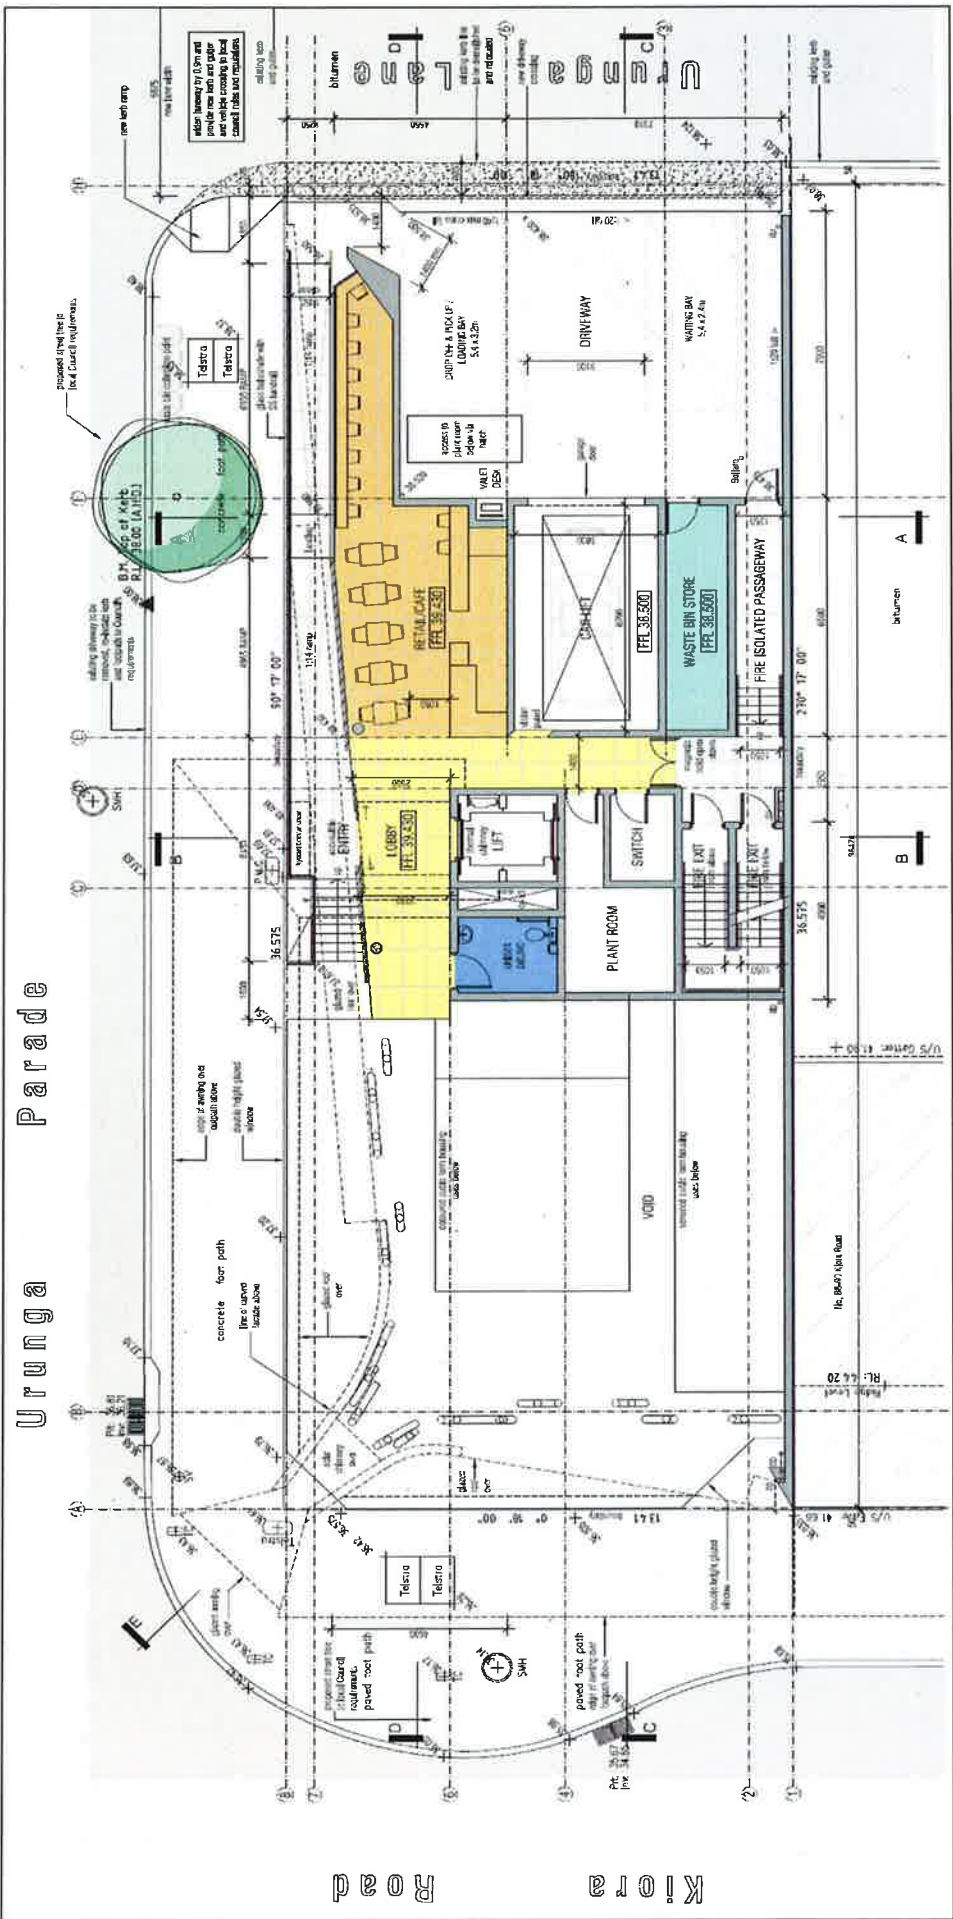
Upper ground floor plan of PPR (Source: PPR)
